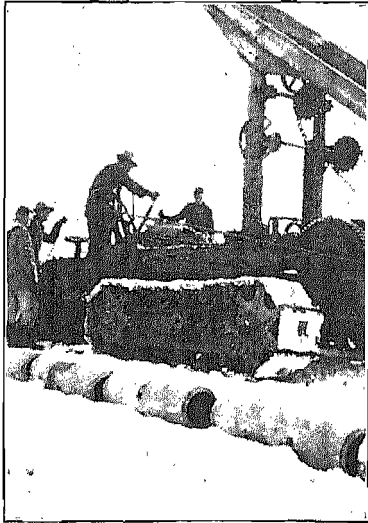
Concrete tongue-and-groove joint pipe ready for placing in the drainage trench. (Photograph by J. R. Barker.)
